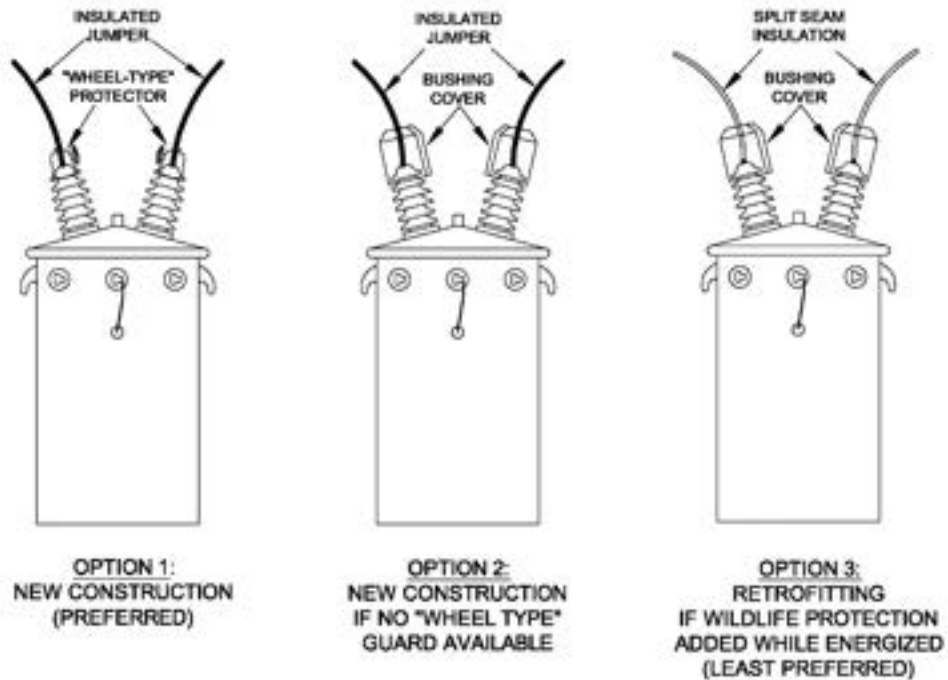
Three options for covering transformer bushings and stinger wires.
